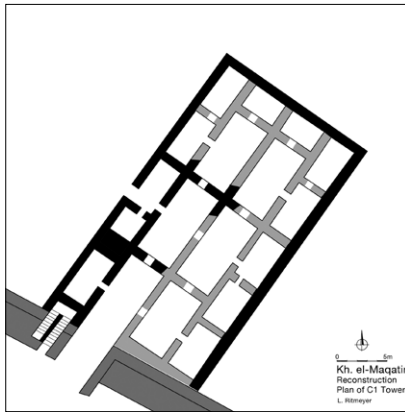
Tower with conjectured staircase (drawing: L. Ritmeyer)
